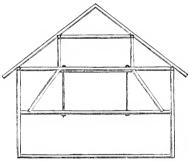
Mode of Framing Truss of Wagon-house, leaving the lower floor clear of all floor, and which is not so soon obstructions—20-foot posts.
